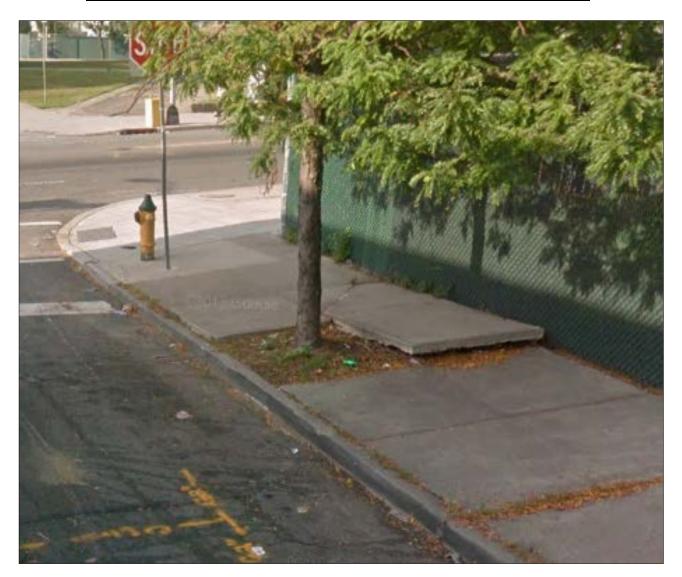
Northwest Corner of the Intersection of Fourth St. and Central Ave.
